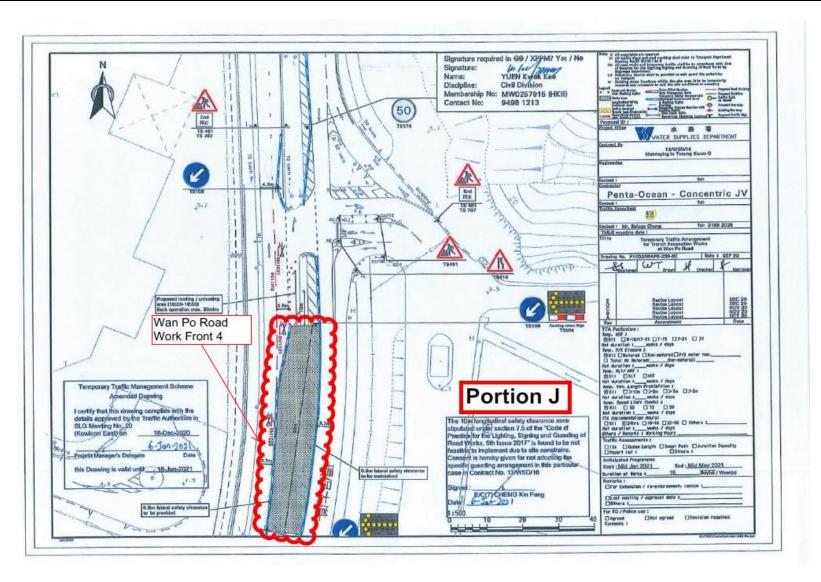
Location Plan for Portion J – Wan Po Road 4
